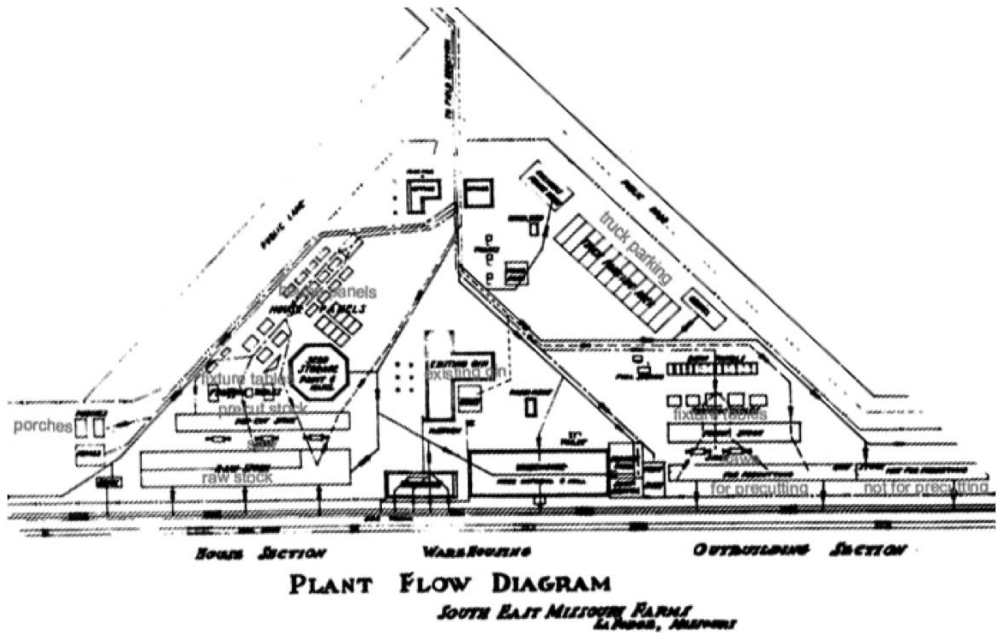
Type B and C Farmhouses, LaForge Missouri, Mo. 1933, FSA. Prefabrication Plant Layout LaForge Missouri
